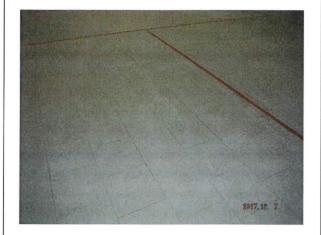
AC 9"x9" green/grey VFT with streaks (HCH – S6) – Room #8 – Raised storage room.
